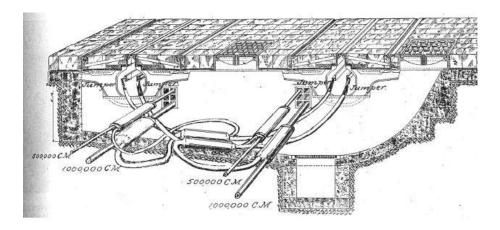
Diagram shows how underground components were installed in a typical manhole.
